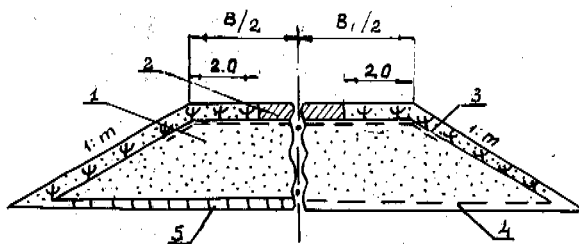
Structure of the embankment including a layer of compressible-on-thawing soil, with heat-insulating layer on the surface: 1- sand; 2- pavement slabs; 3- geotextile under the pavement slabs; 4- geotextile in the embankment foundation; 5- plastic foam of reduced thickness
